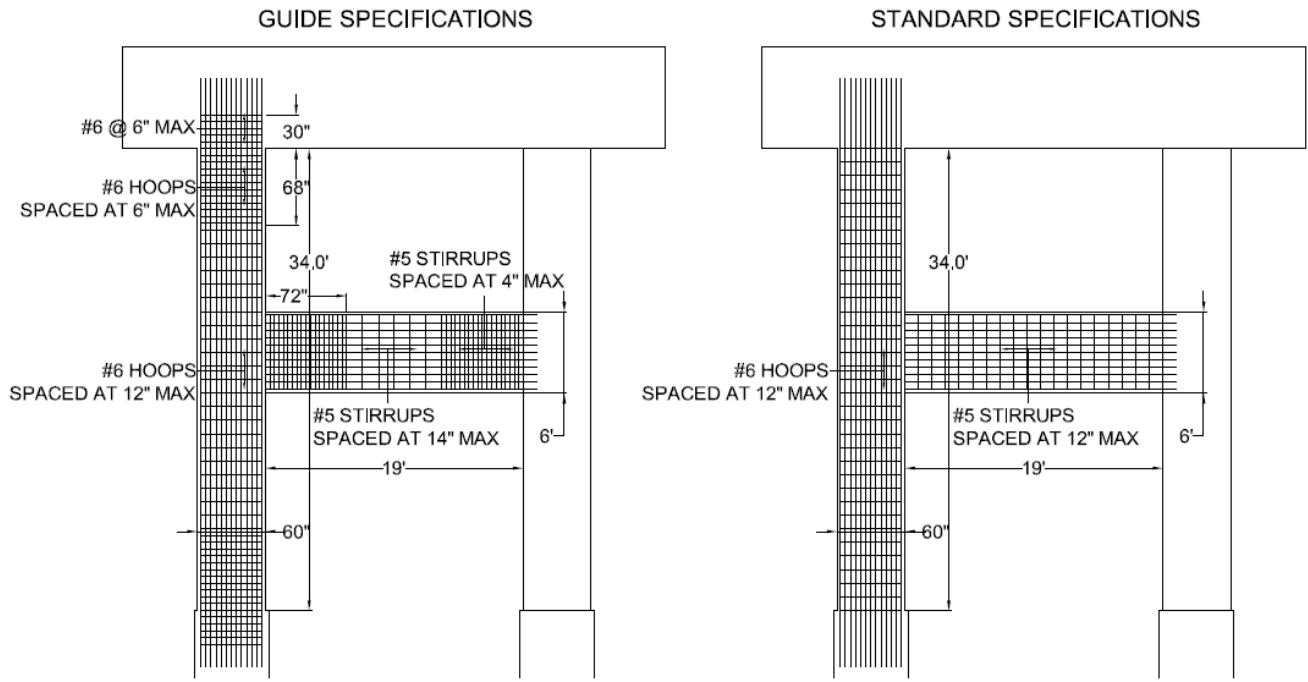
Scarham Creek Bridge Bent 2 Final Design Details
